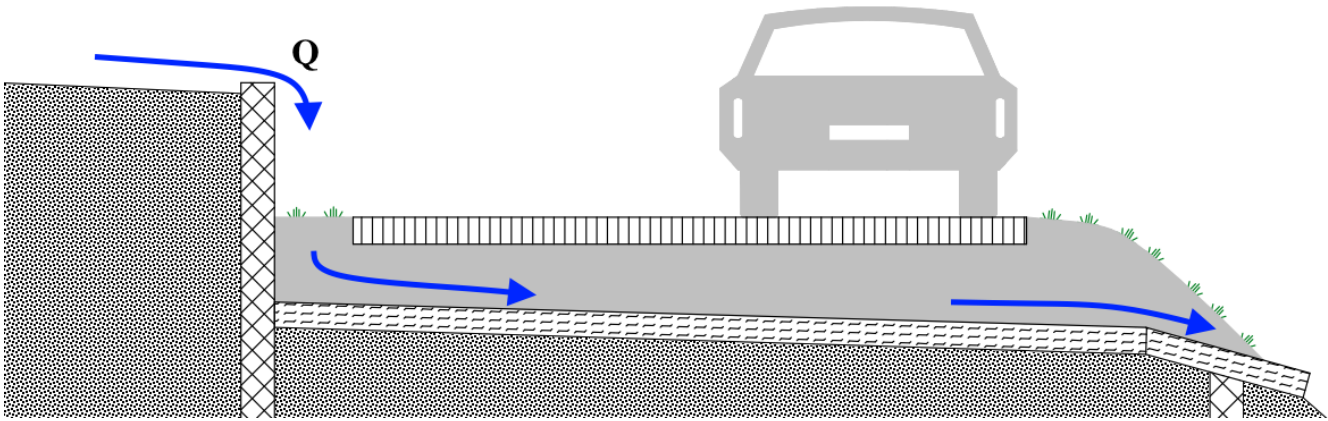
Cross-section of a culvert under Weg near White Wall for gully 2 or 3. The culvert can be a covered design, such as the already existing culvert in gully 1. Alternatively, the watercourse can be covered with a removable grate (see figure 6.1b) that allows for road drainage, as well as easy inspection and maintenance. A retaining wall will prevent the water from cutting into the soil as it flows towards road level. This allows the current gully profile to be conserved. The outlet should be protected against undercutting.
